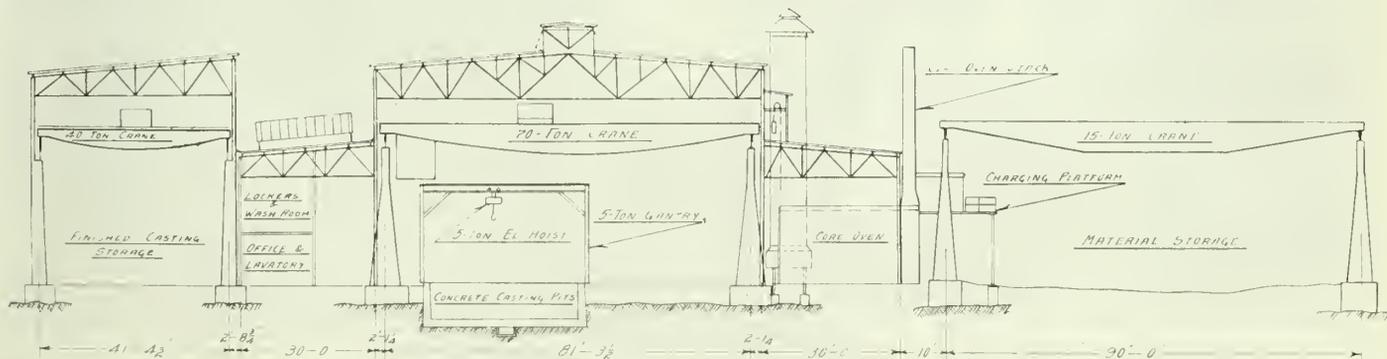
Shows Cross section view of foundry department, Dominion Engineering Company, Montreal.
